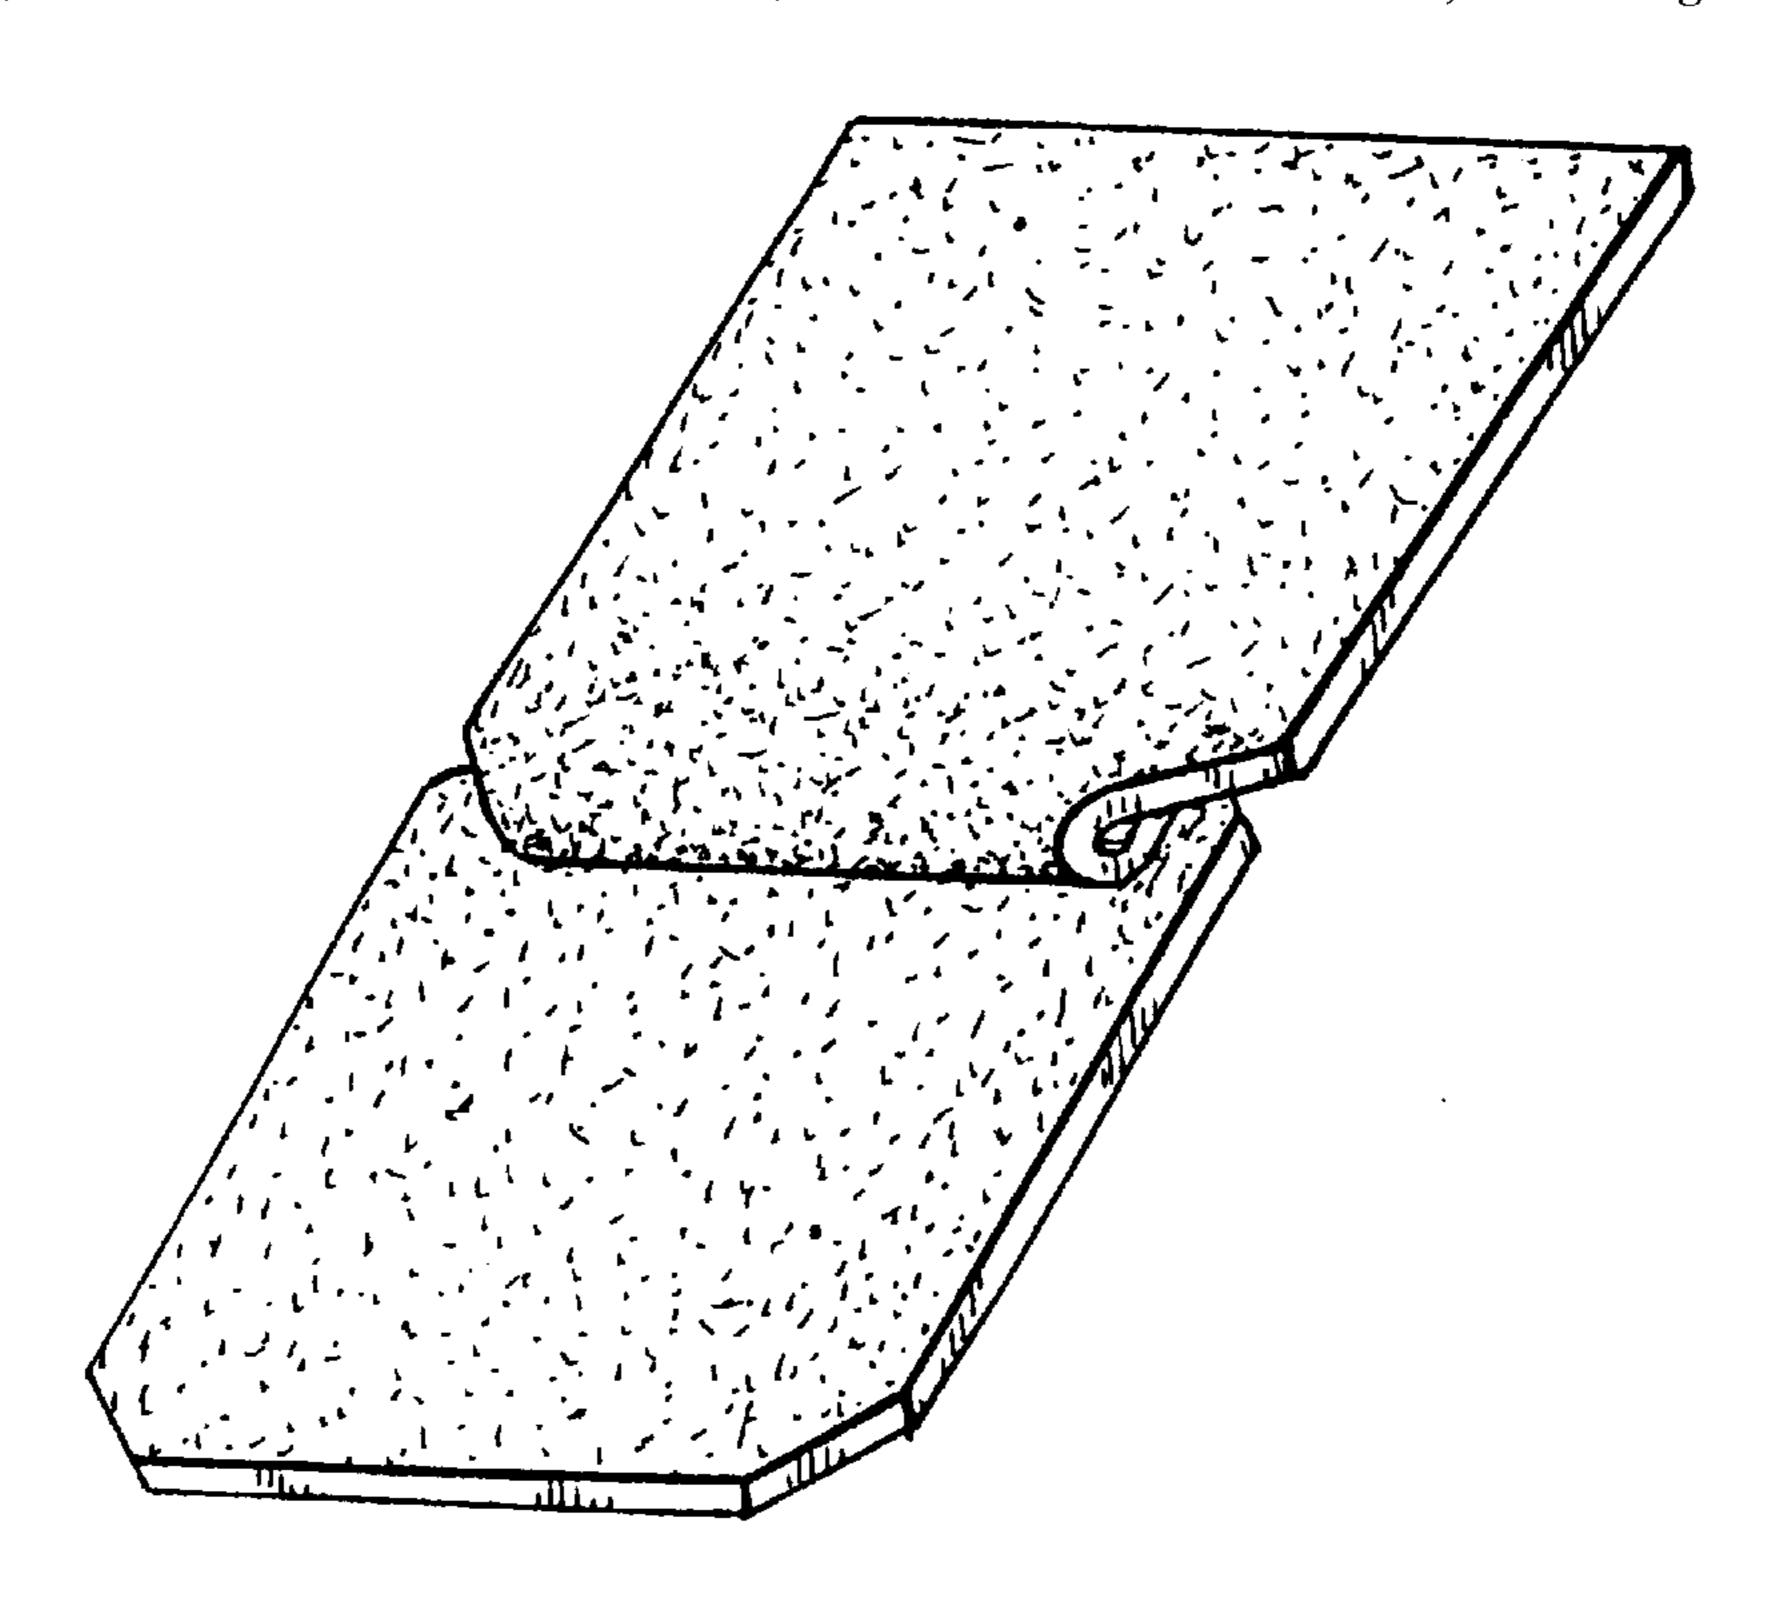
is a top perspective view of a second embodiment of the folded hip and ridge roofing shingle;
